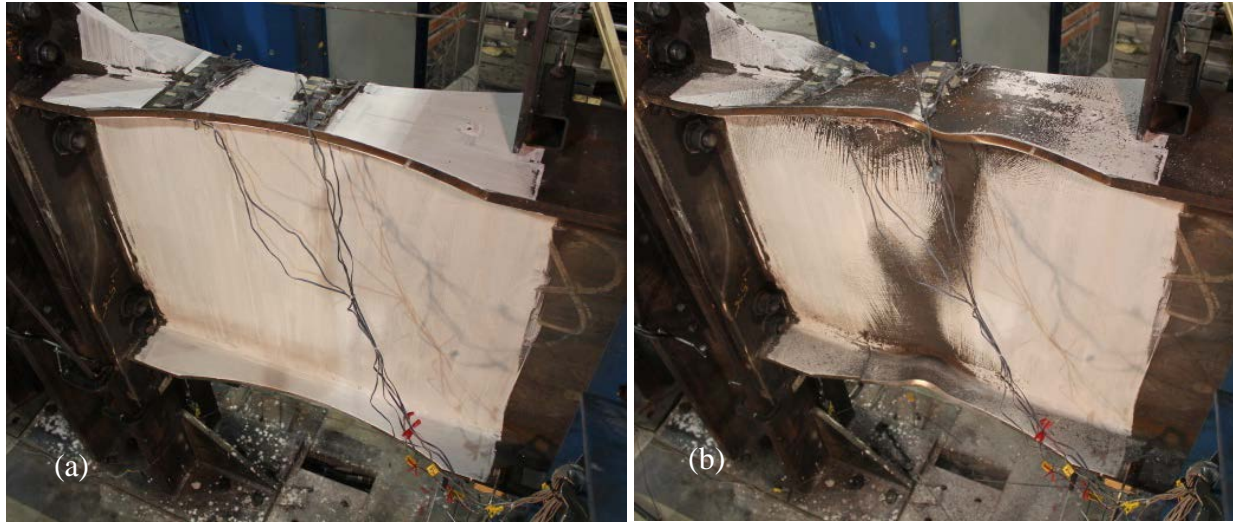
Angled View Pictures of Specimen 8 (W36x150 with RBS and Puddle Welds) at (a) Start of Test, and (b) Final Deformation
